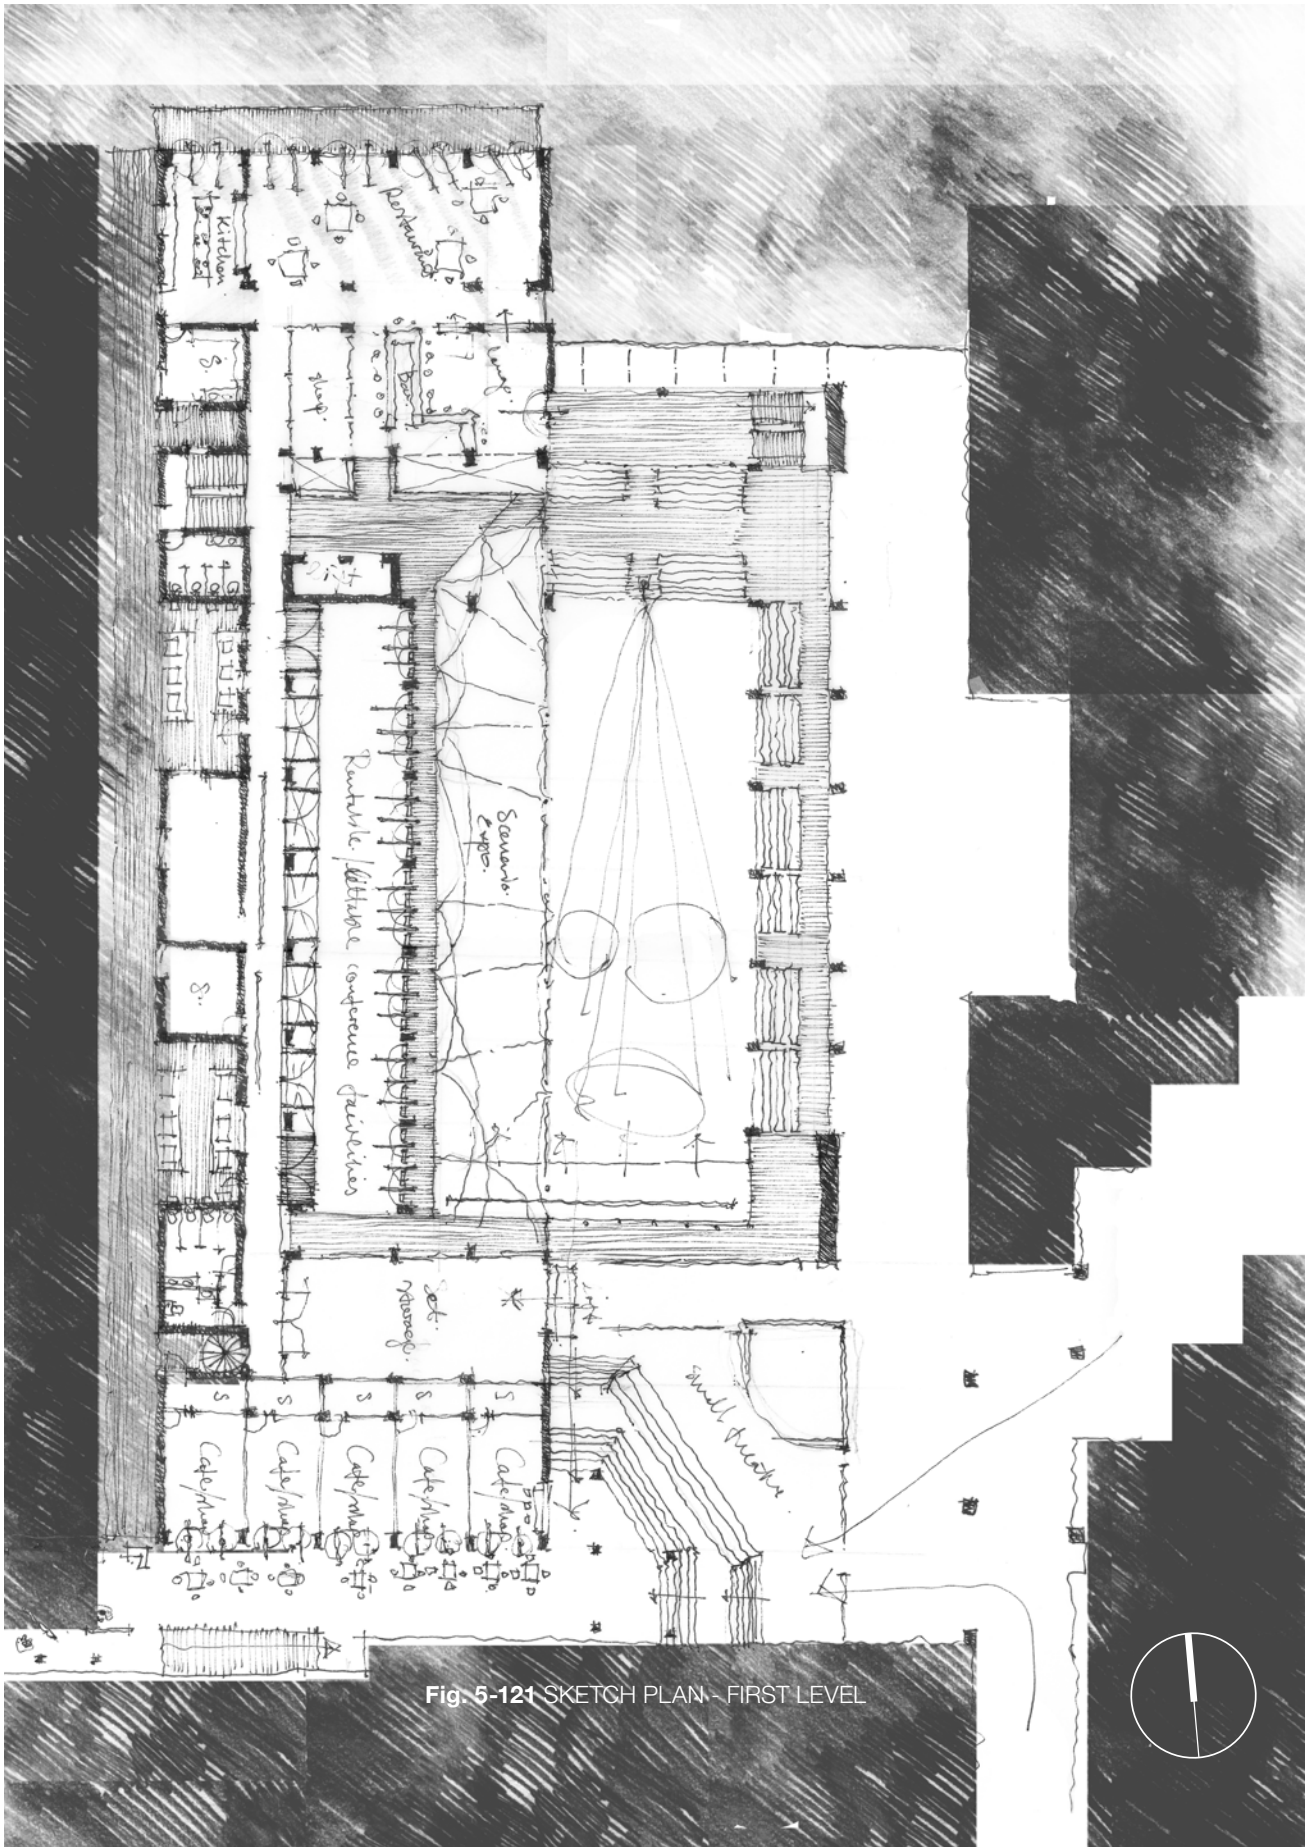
SKETCH PLAN - FIRST LEVEL
